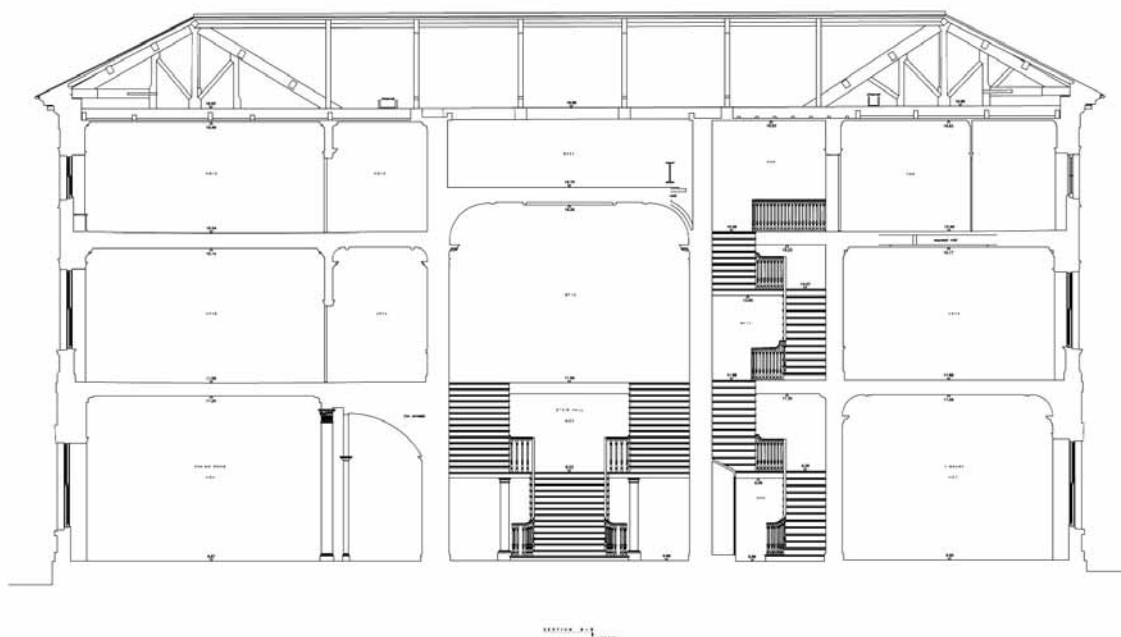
Lytham Hall north-south cross section, Foster survey drawing, with permission Lytham Hall Heritage Trust. The shown roof trusses are probably T2 and T13
